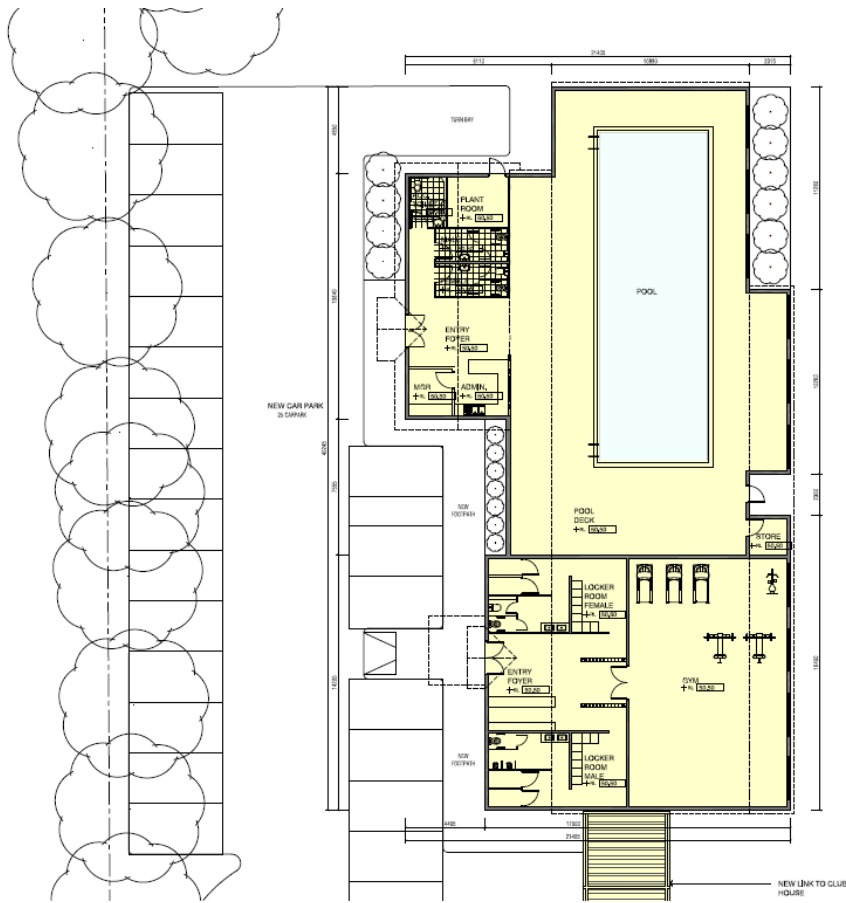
Proposed buildings: Wallacia Country Club (new carpark and pool)
